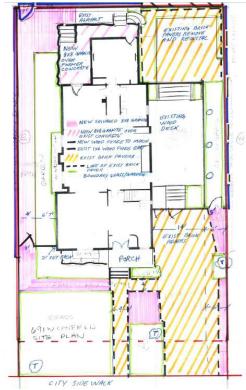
& 3, by Applicant, showing the rear basement site plan and elevation of proposed/completed work.
